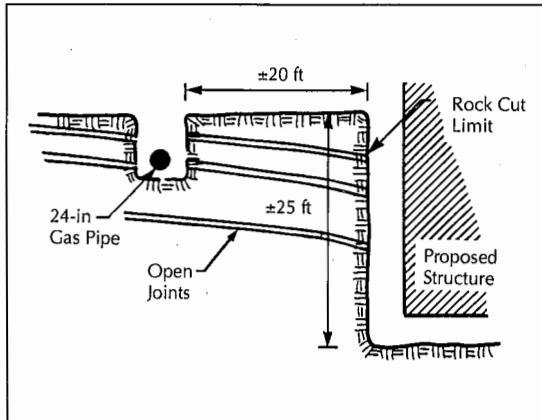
Schematic section view showing the proximity of blasting to a gas pipeline and open, near horizontal joints.
